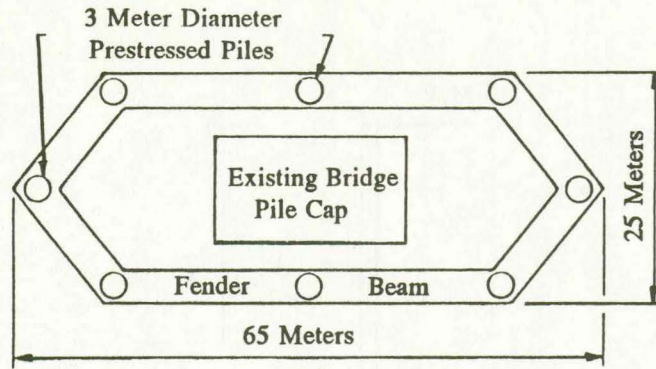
Plan of Pile Supported Pier Protection System Evaluated for the Tasman Bridge, Australia [12]. (All Units are Metric)
